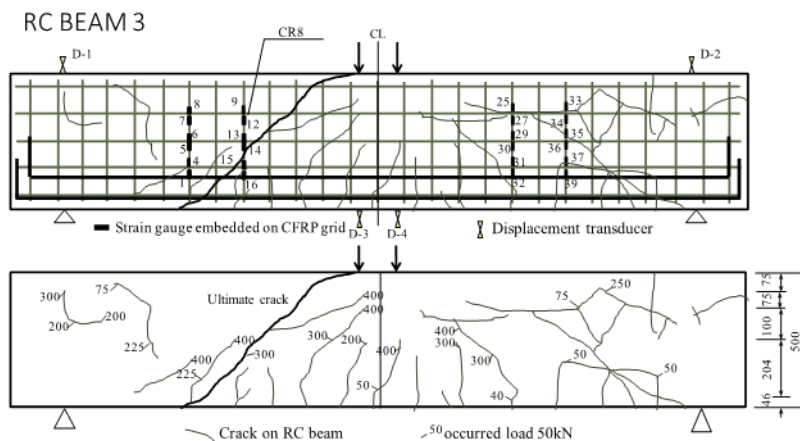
Locations of strain gauges on CFRP grid and experimental cracks in RC beam 3
